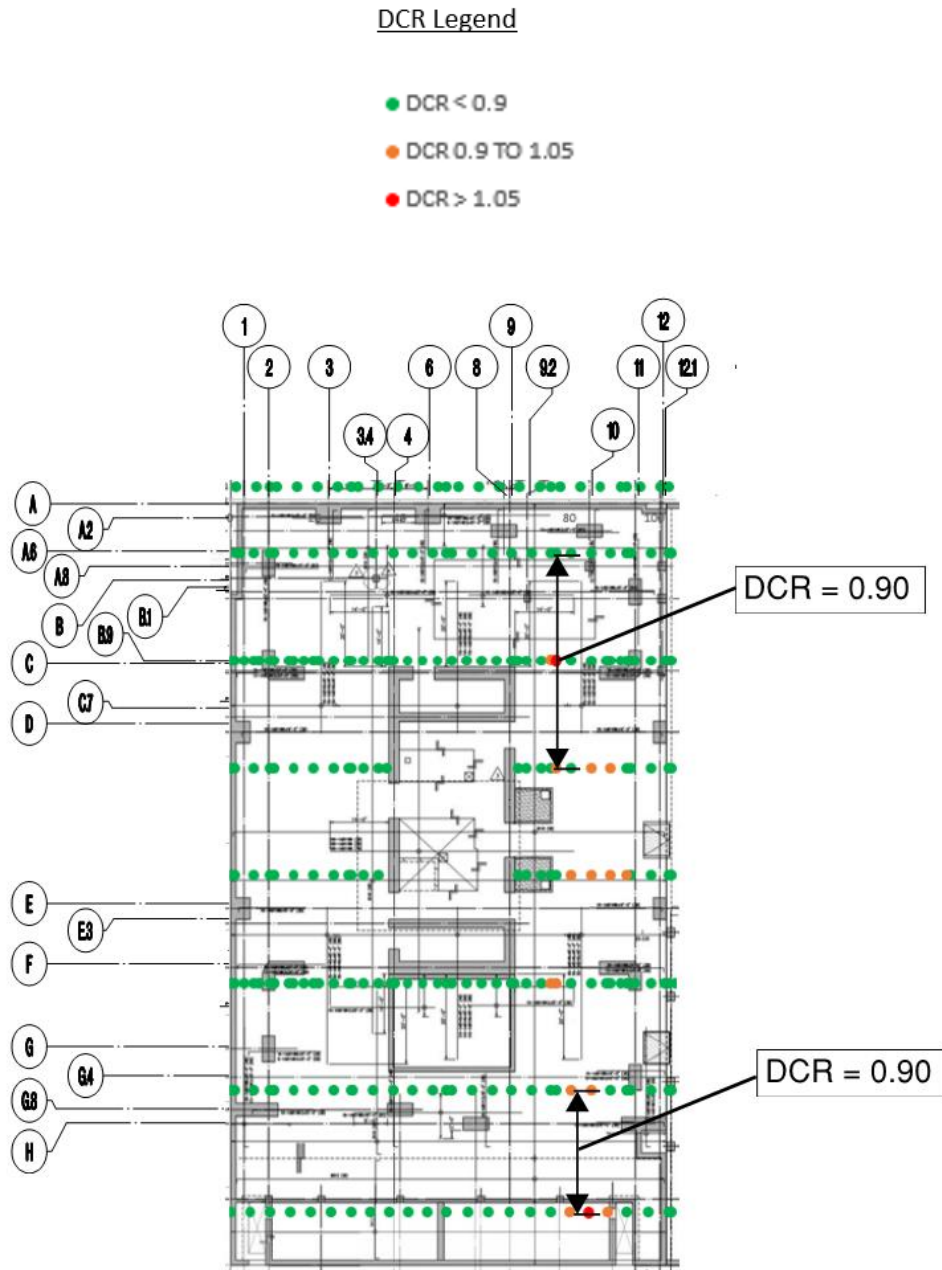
DCR Plot for East-West Top Reinforcement Design Strips for Gravity Load Envelope with Jacking Loads
